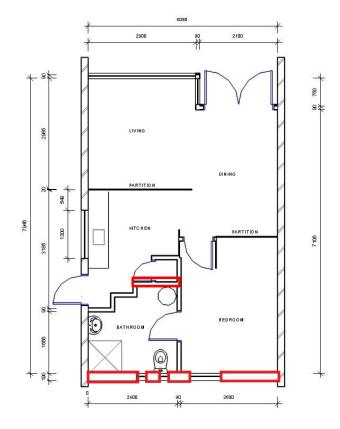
Walls used for bracing in the longitudinal direction residential units.
